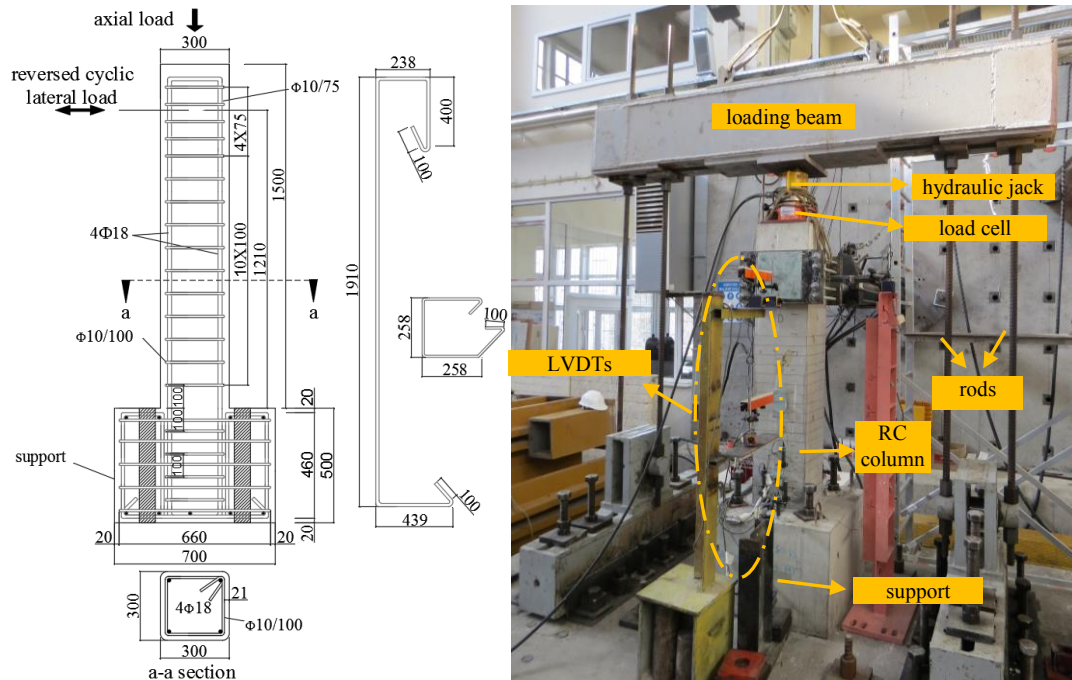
(a) Reinforcement cage of the columns, (b) Test set-up.
